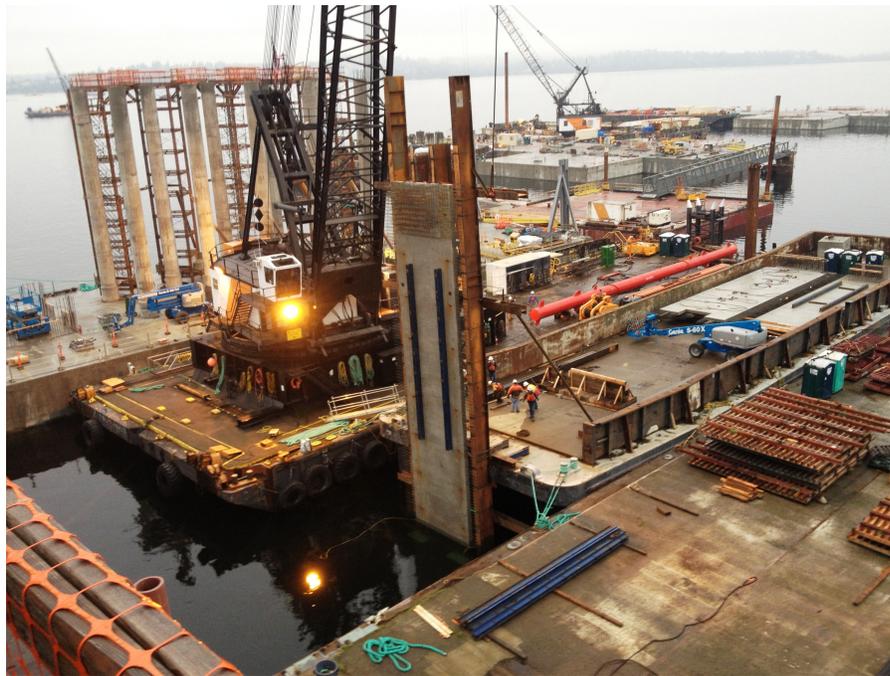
Pontoon W precast box column panel being tilt vertically.
